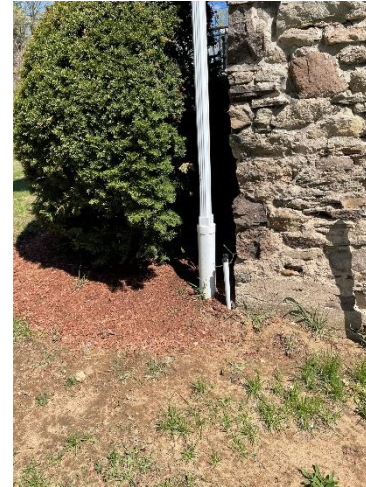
Existing conditions with downspouts connected directly into the underground drainage system.
